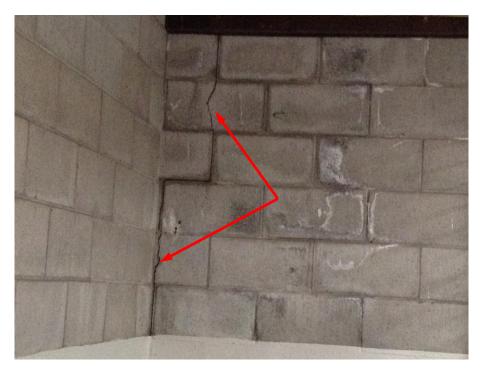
Vertical cracking to concrete masonry wall in the order of 3.5mm at corner where intersecting walls occur
